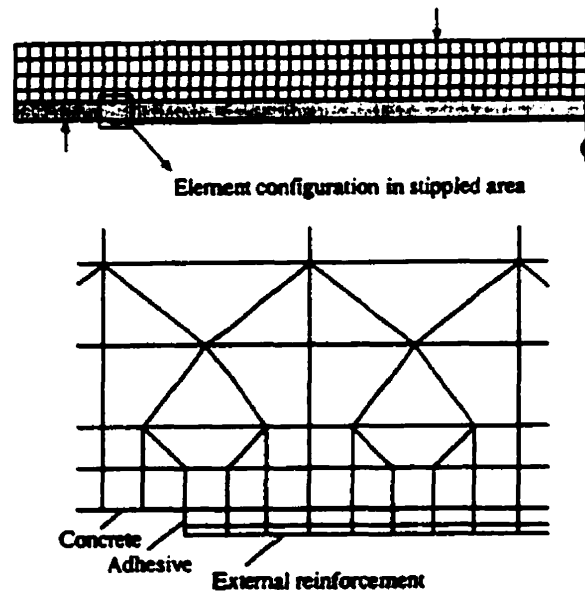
Typical FE mesh for RC beam with externally-bonded FRP reinforcement [12]
